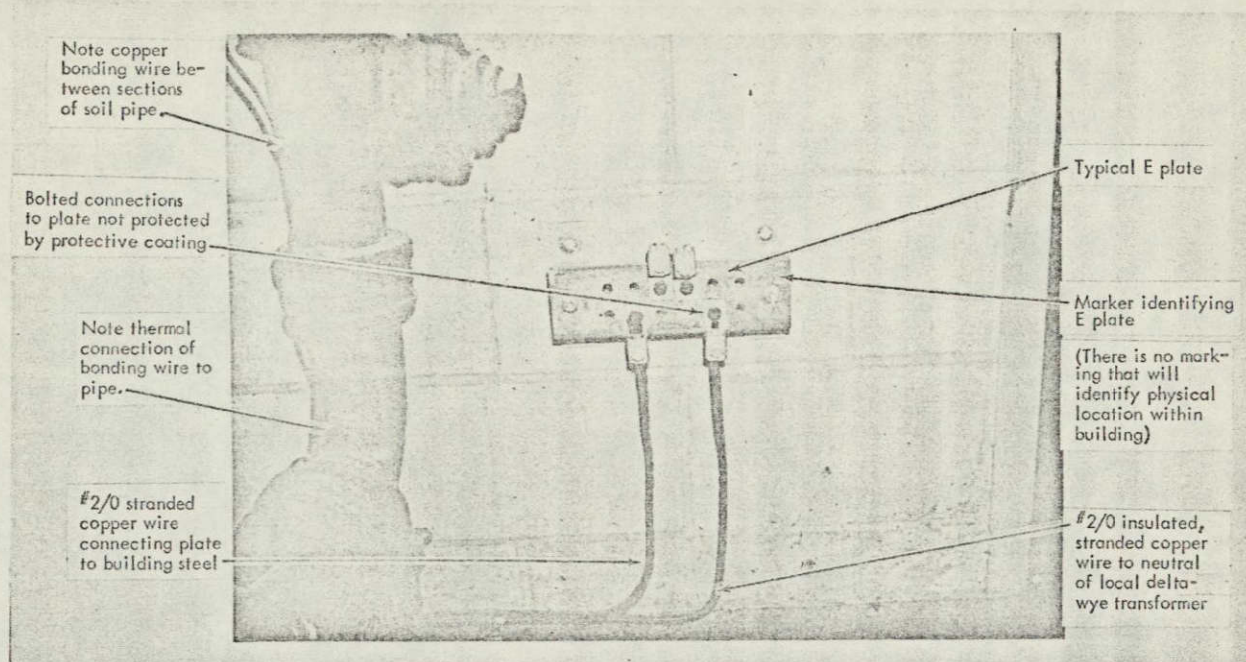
Typical E-Plate in High-Bay/VAB. Note bonding used between leaded sections of soil pipe.
